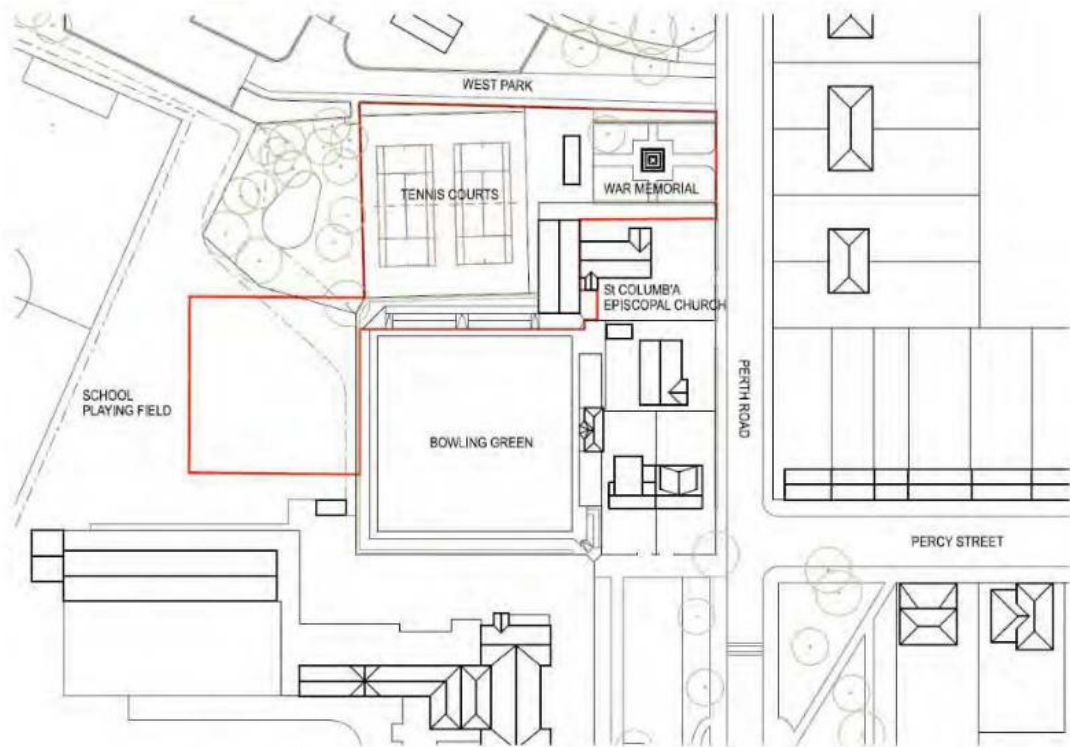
Site Plan Showing the Area Proposed to be Re-developed
